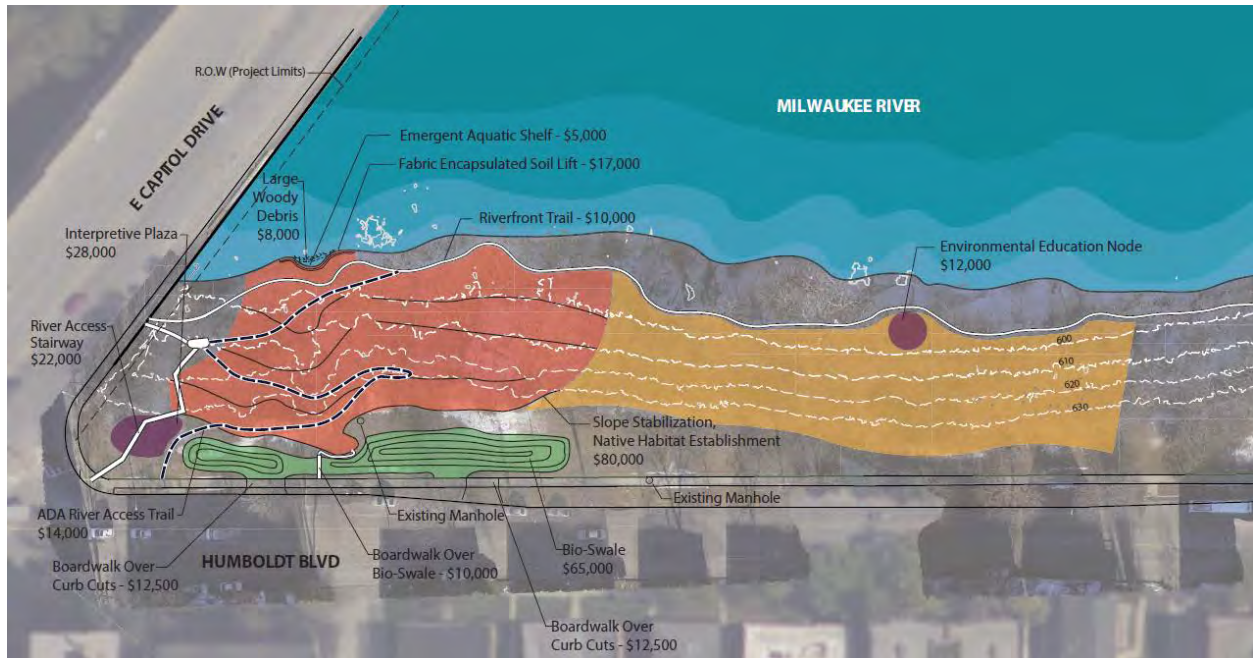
Plan graphic showing cost of each project component. Additional costs for permitting, quality assurance, construction oversight, post construction maintenance, and contingency not shown on plan.
